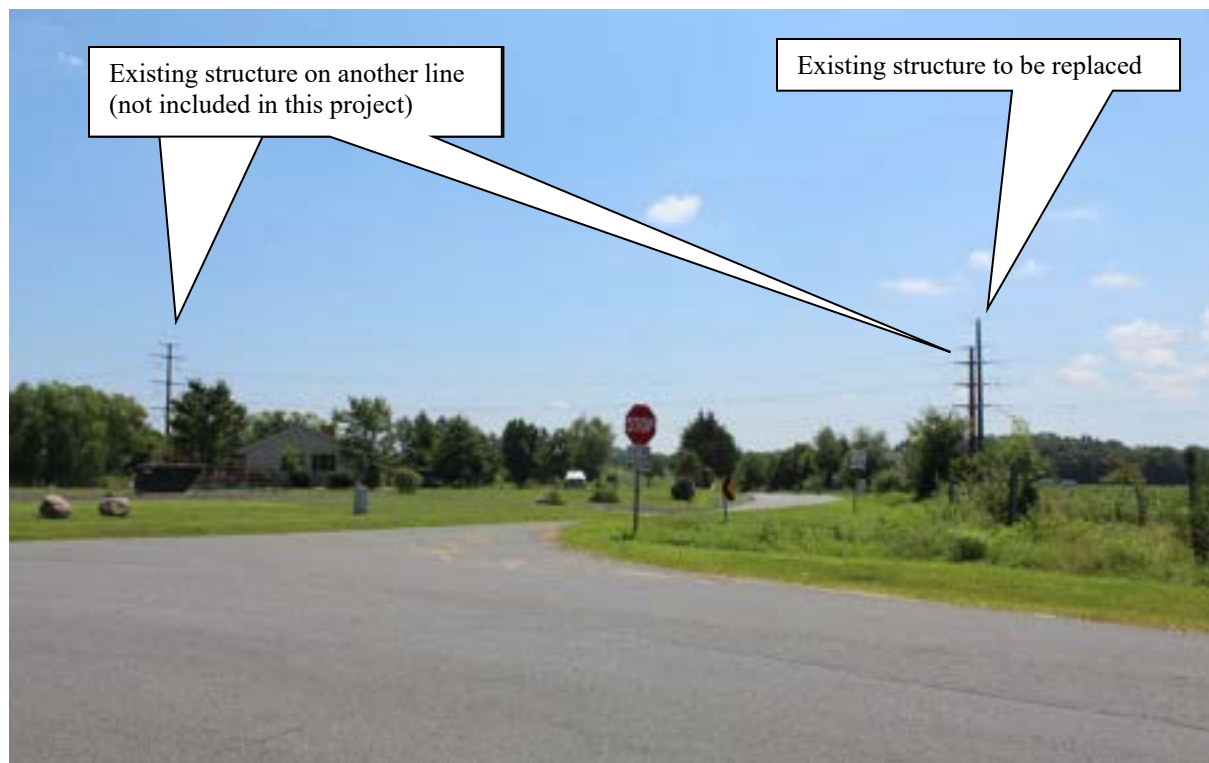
Photo location 4- View from road in front of Rose Hill across street (existing project structure and multiple other structures visible), facing east.
